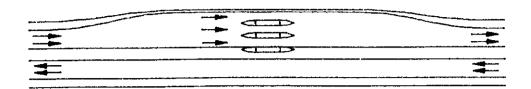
Typical Layout of Toll Barrier on Bypass Throughway
